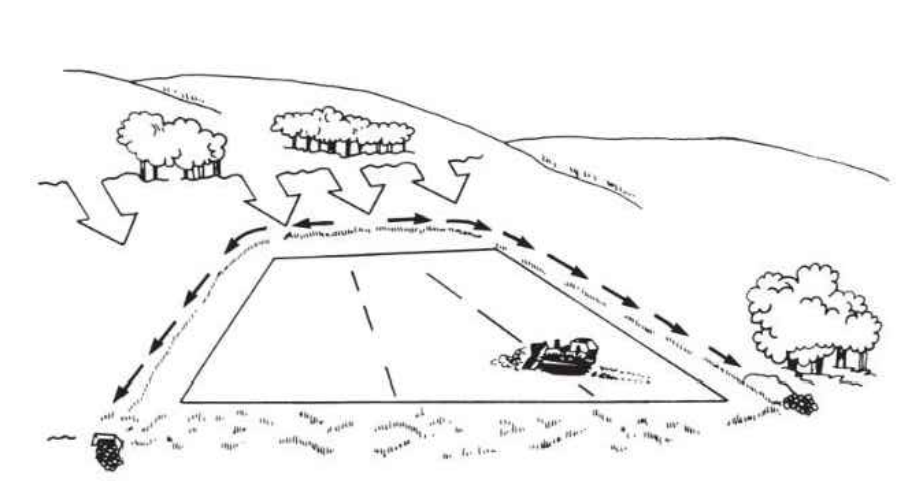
Perimeter dikes prevent surface runoff from entering construction sites.
